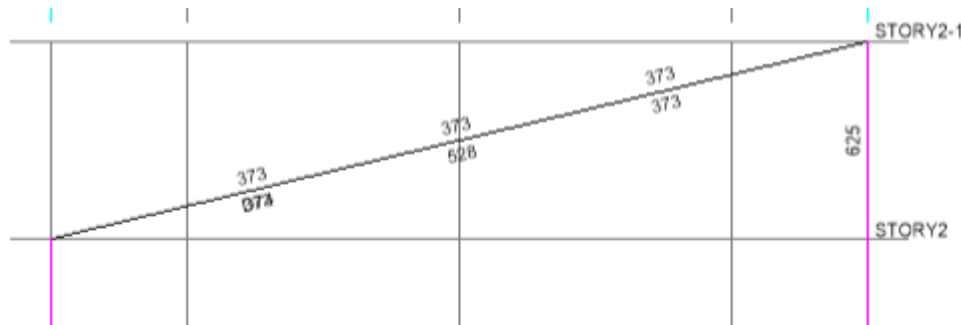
(d) Inclined beam reinforcement – Axis 1'
